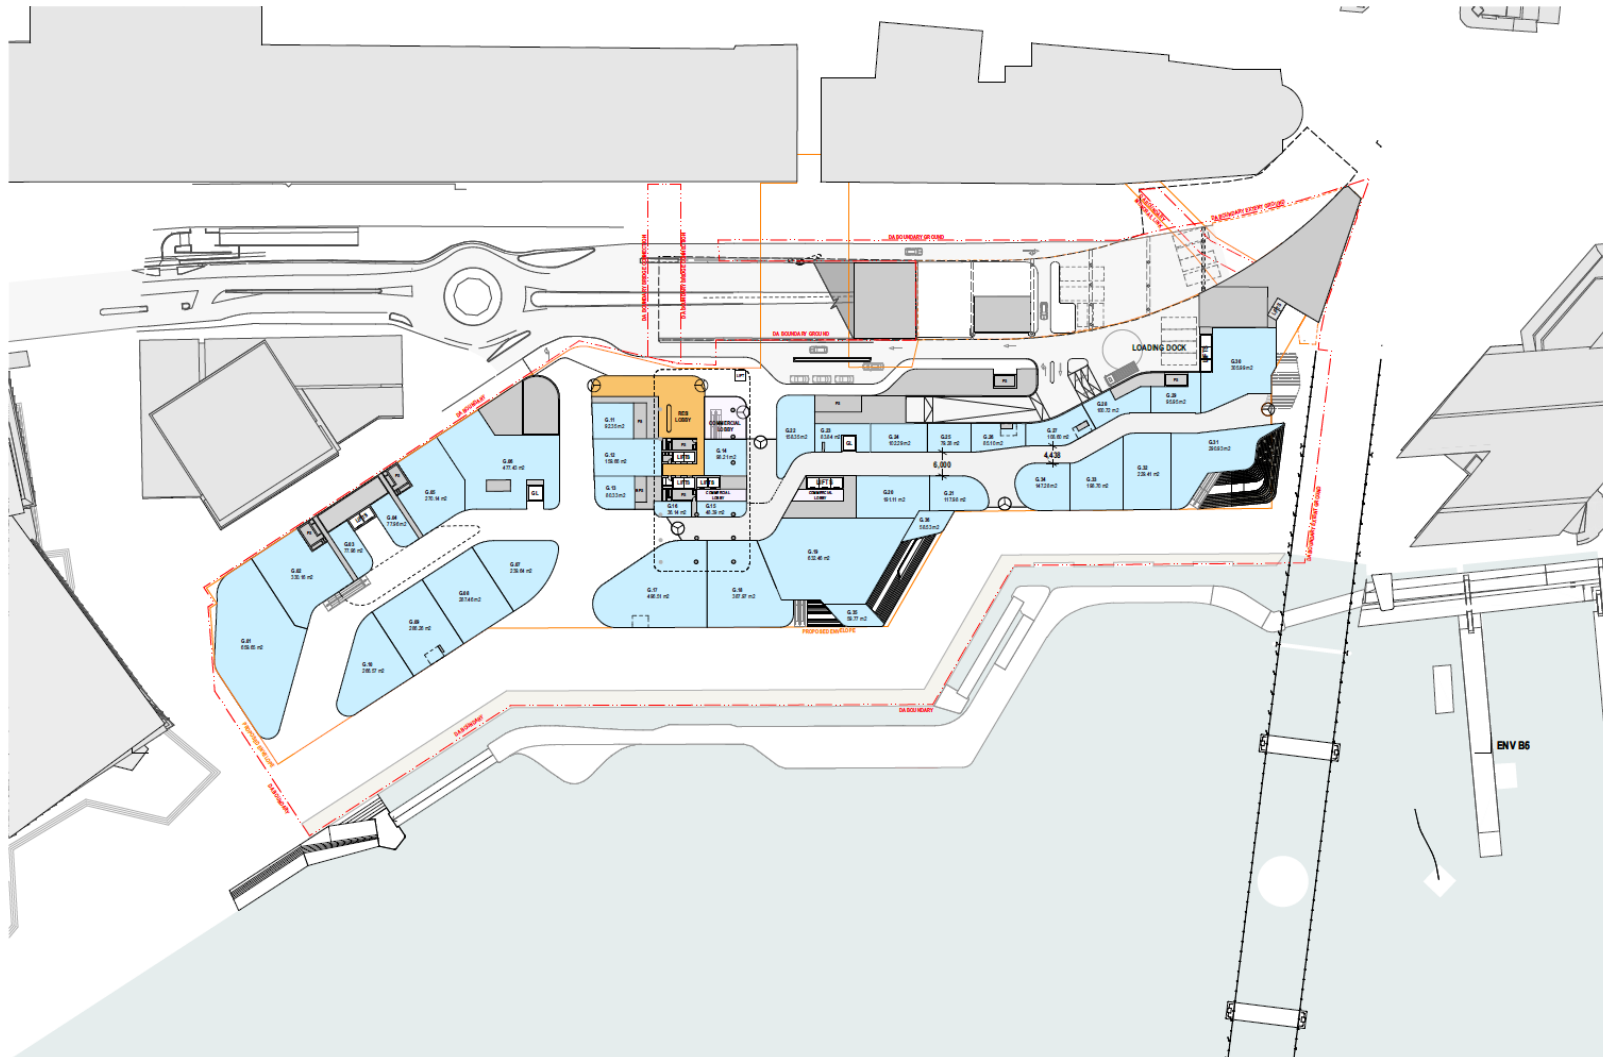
Ground Floor Retail – Indicative Plan Only (Source: FJMT, 2020)
